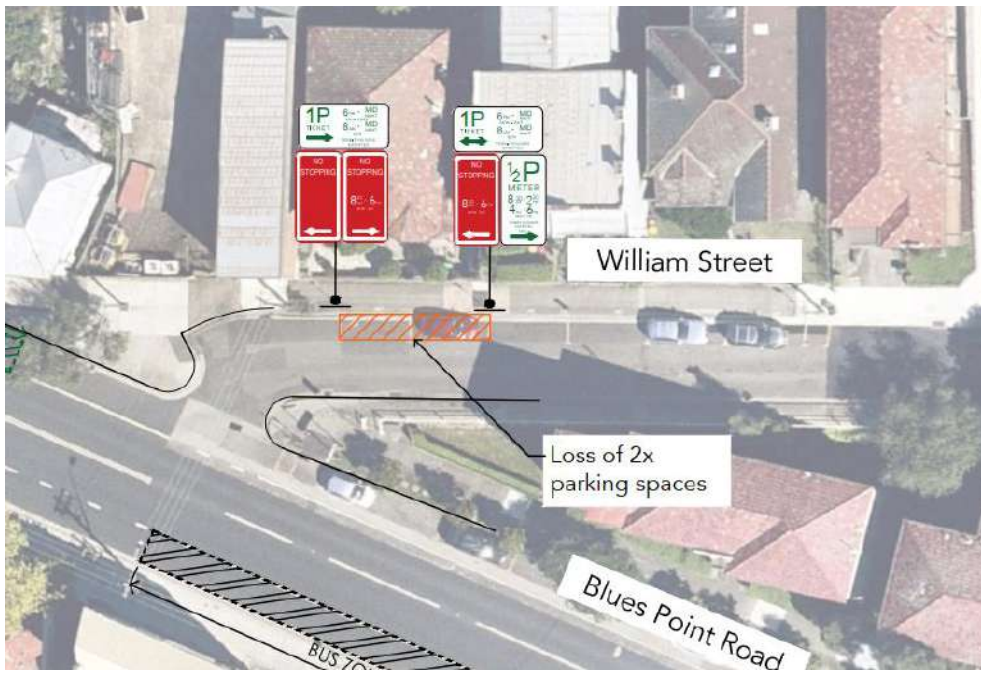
Proposed Signage Plan in William Street and Blues Point Road Intersection (Excavation and Construction Stages)
